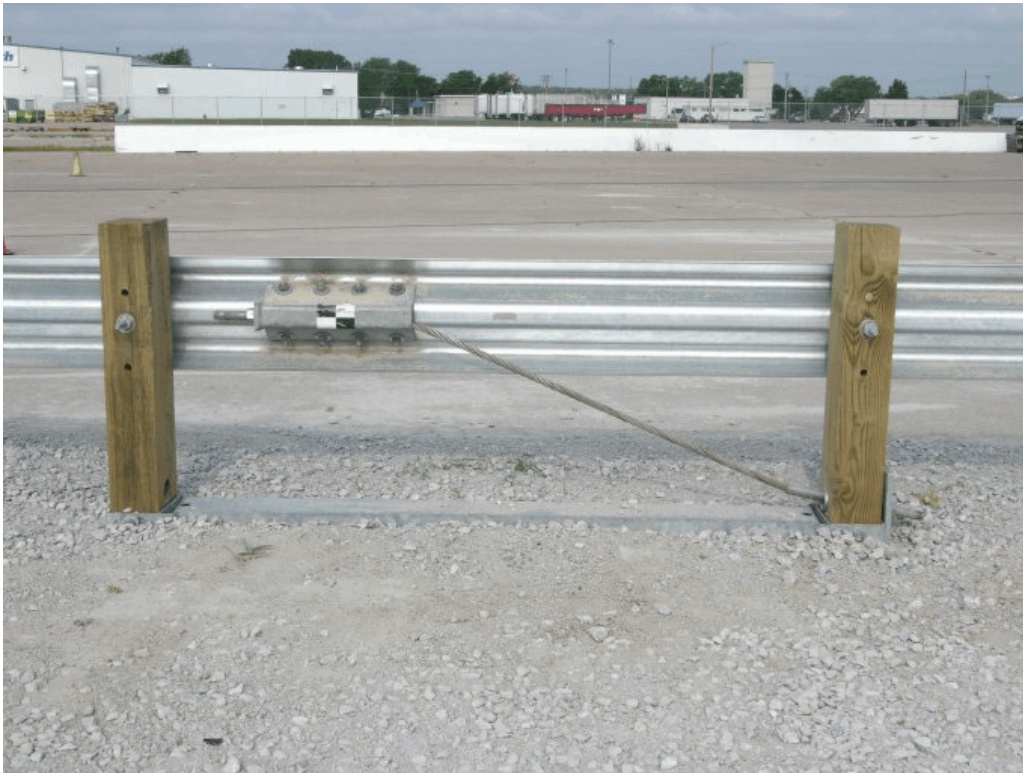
MGS Installed Adjacent to a 2:1 Fill Slope, Test No. MGS221-1
